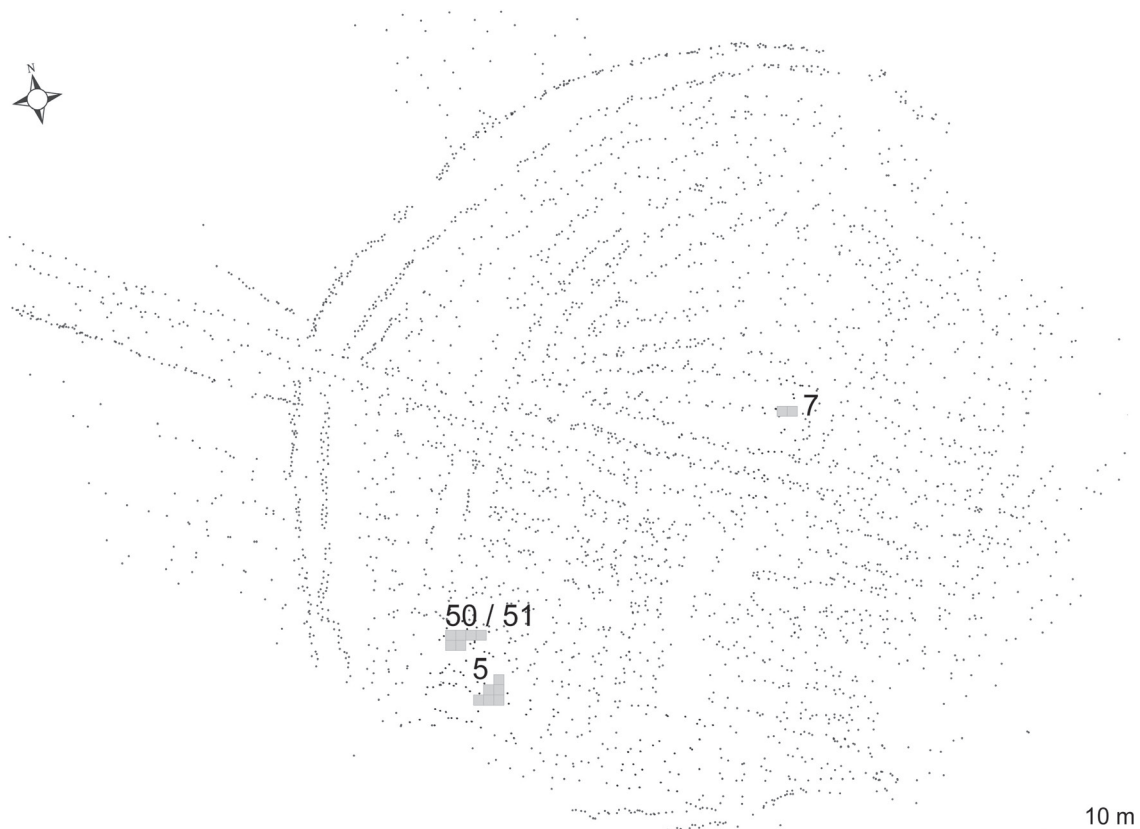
Site plan with piles and sections 7 and 50/51 where samples were taken.
